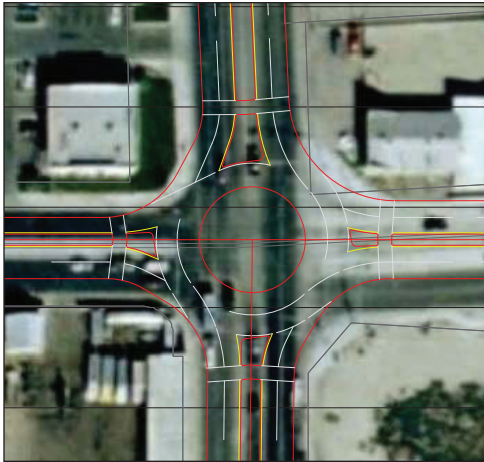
Roundabout layout at Harrison Street and Avenue 50.
